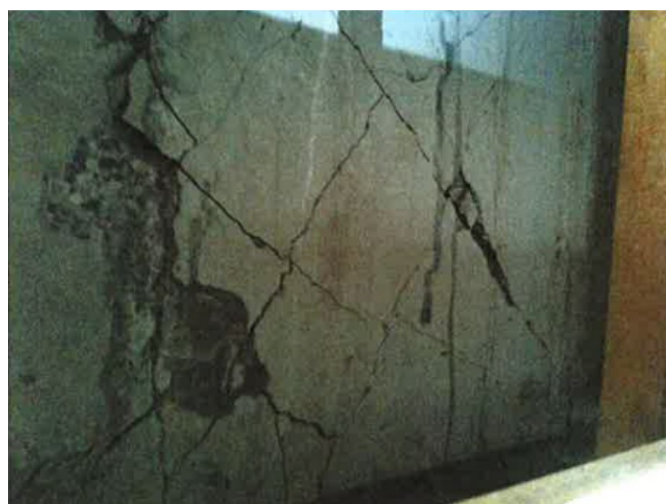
Shear Link Connection Damage in Clarendon Tower's North Frame [28]
